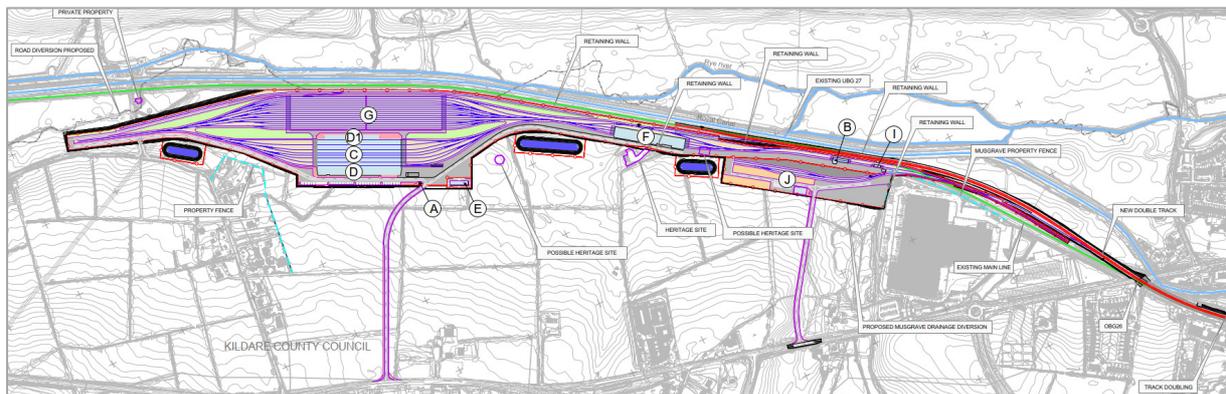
Option 33 Kilcock West Site No.3 Layout
